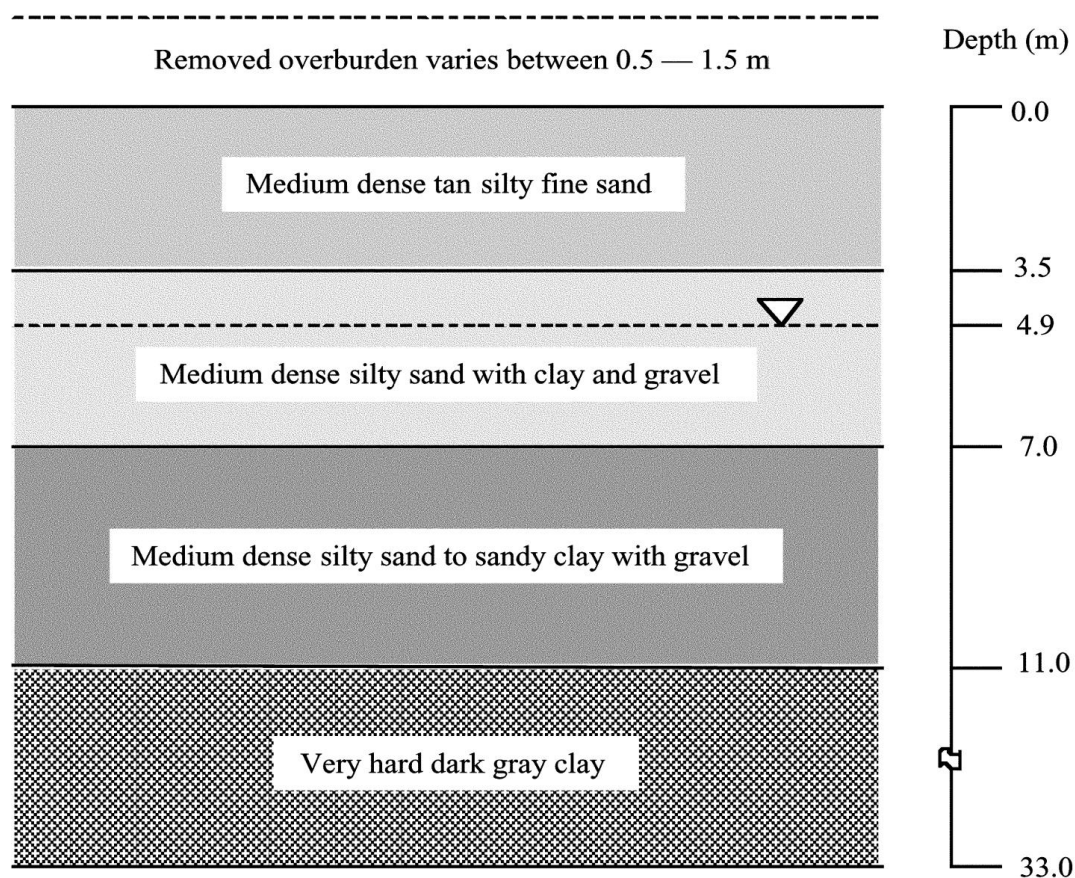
Soil profile at Texas A & M footing load test site(Lee and Salgado 2002).
